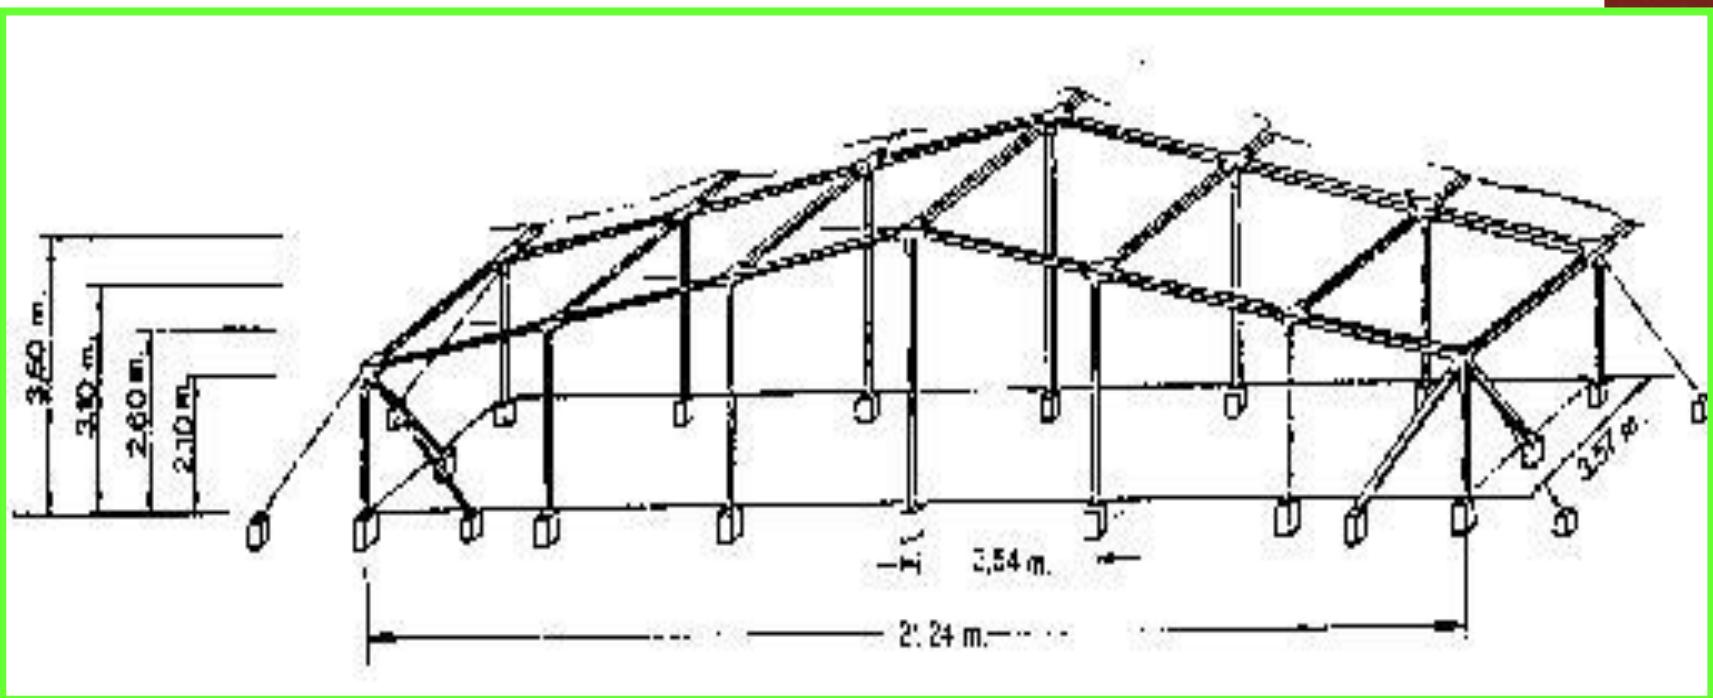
Typical structure of the 'Parral-type' greenhouse in Almeria (Spain)
